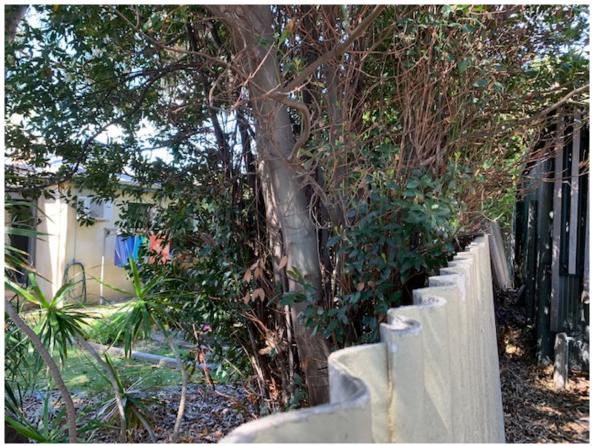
View from street along the existing dividing fence showing the vegetation on the adjoining lot. Proposed garage will be forward of the shed shown on the right.
